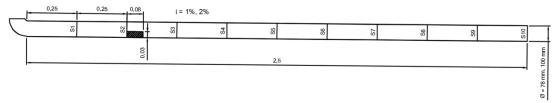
Configuration of the horizontal drain pipe of a 6 liters water closet
